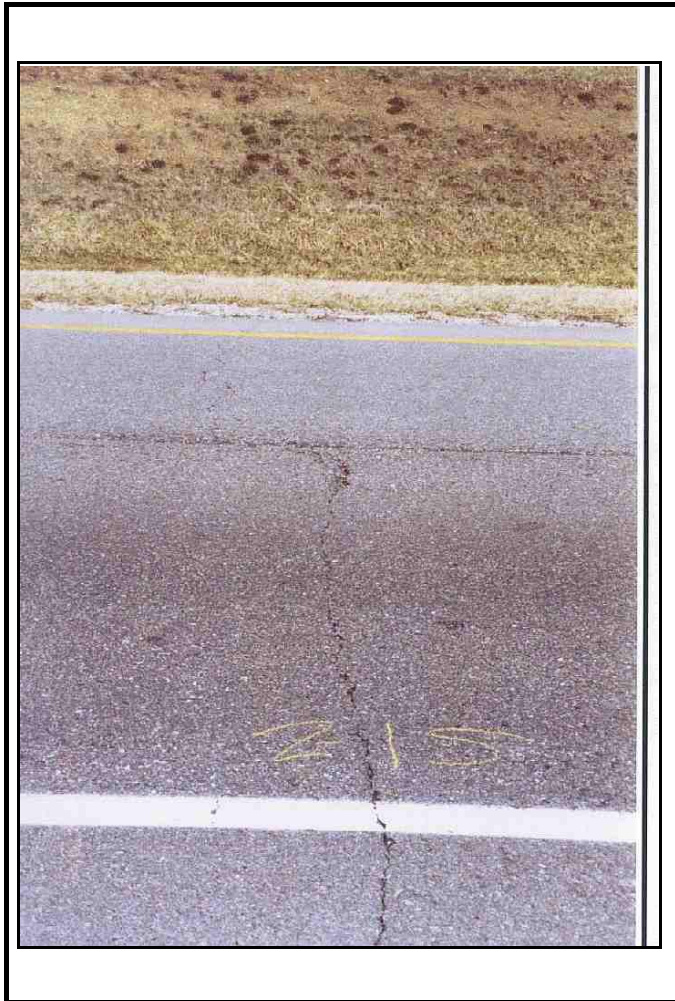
Unjointed Base, Transverse Cracking in Composite Pavement, Low Severity
